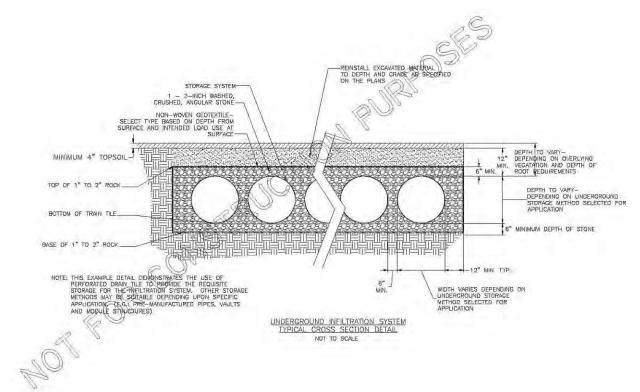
Design recommendations for underground infiltration systems (cross-section).
